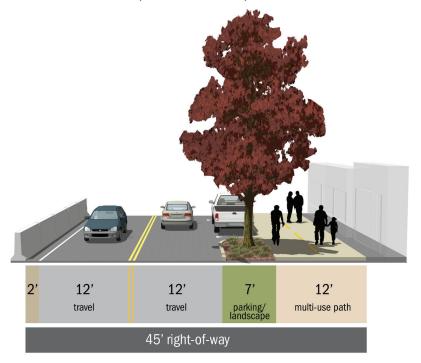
CONCEPTUAL CROSS-SECTION FOR MAIN ST - NORTH OF BETA ST WITHIN EXISTING RIGHT-OF-WAY (LOOKING NORTH)
